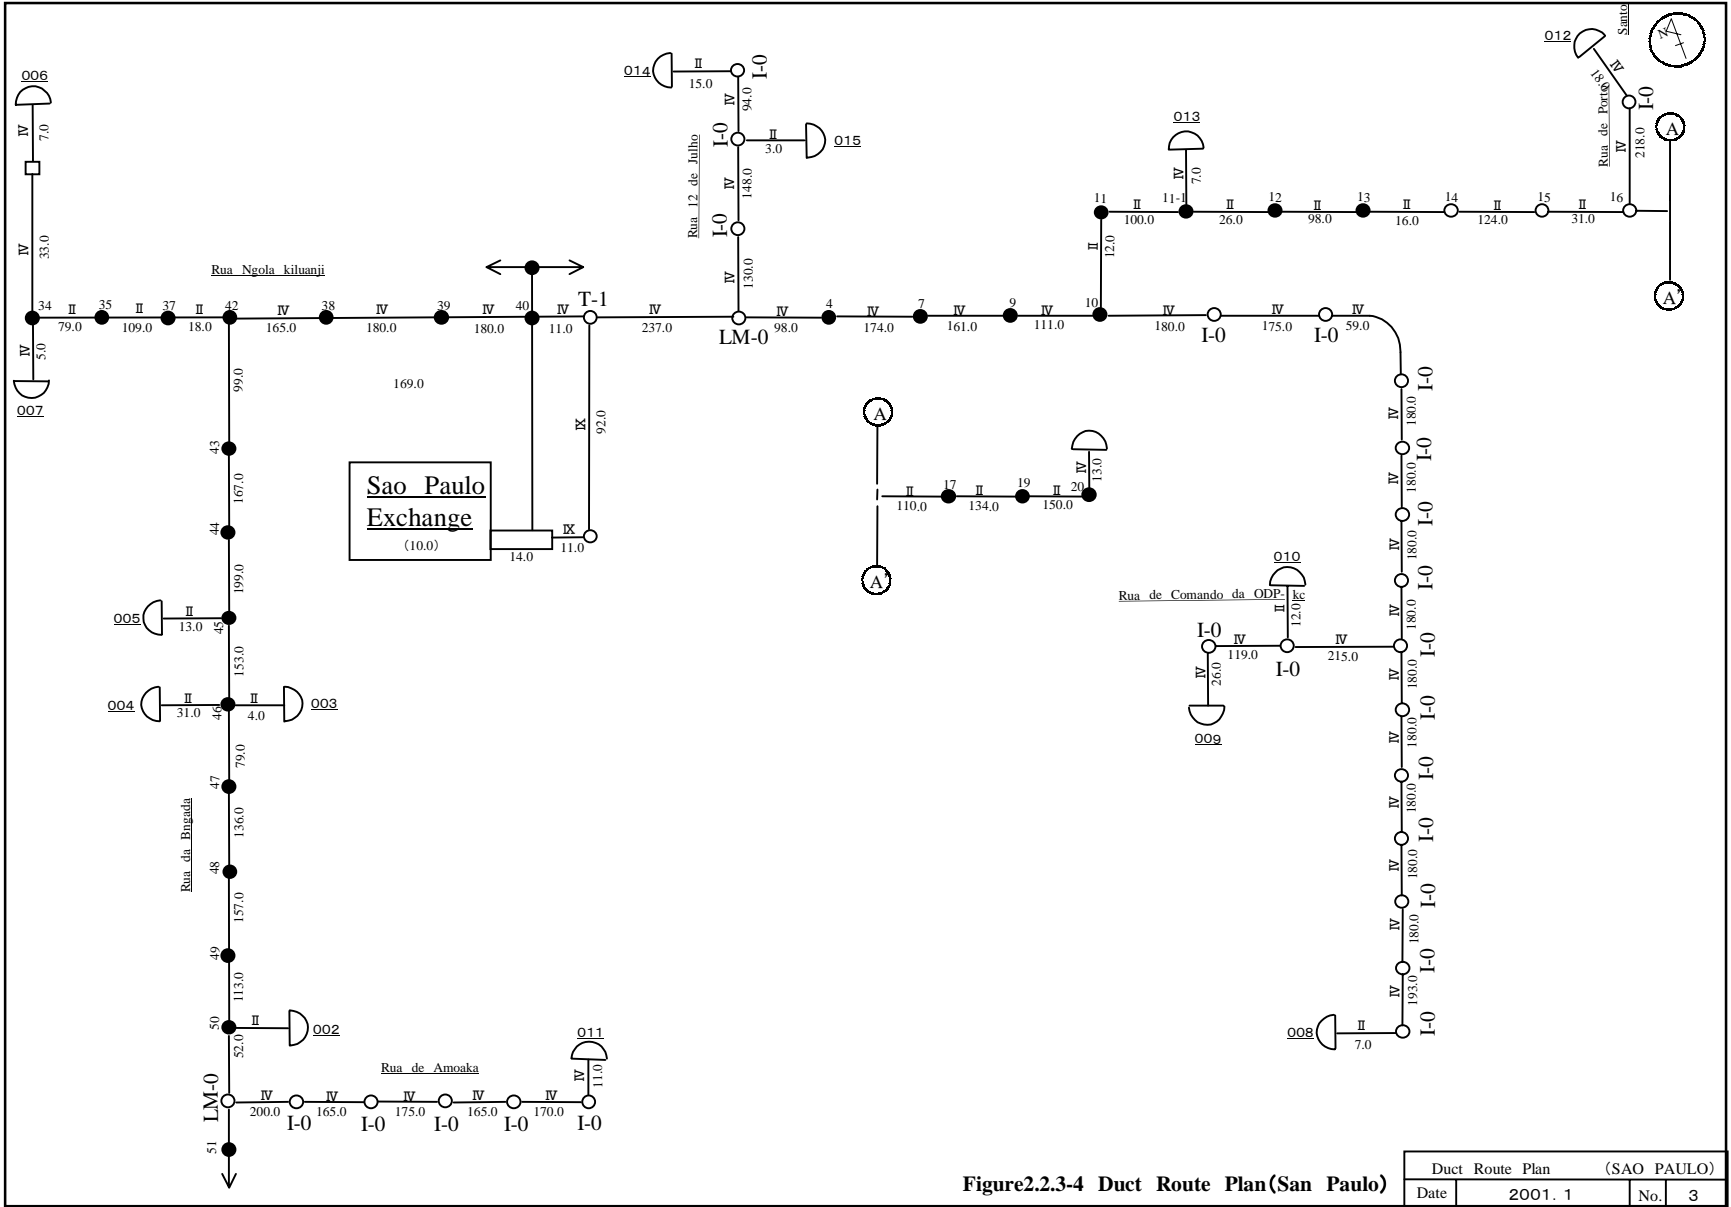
Duct Route Plan(Sao Paulo)
